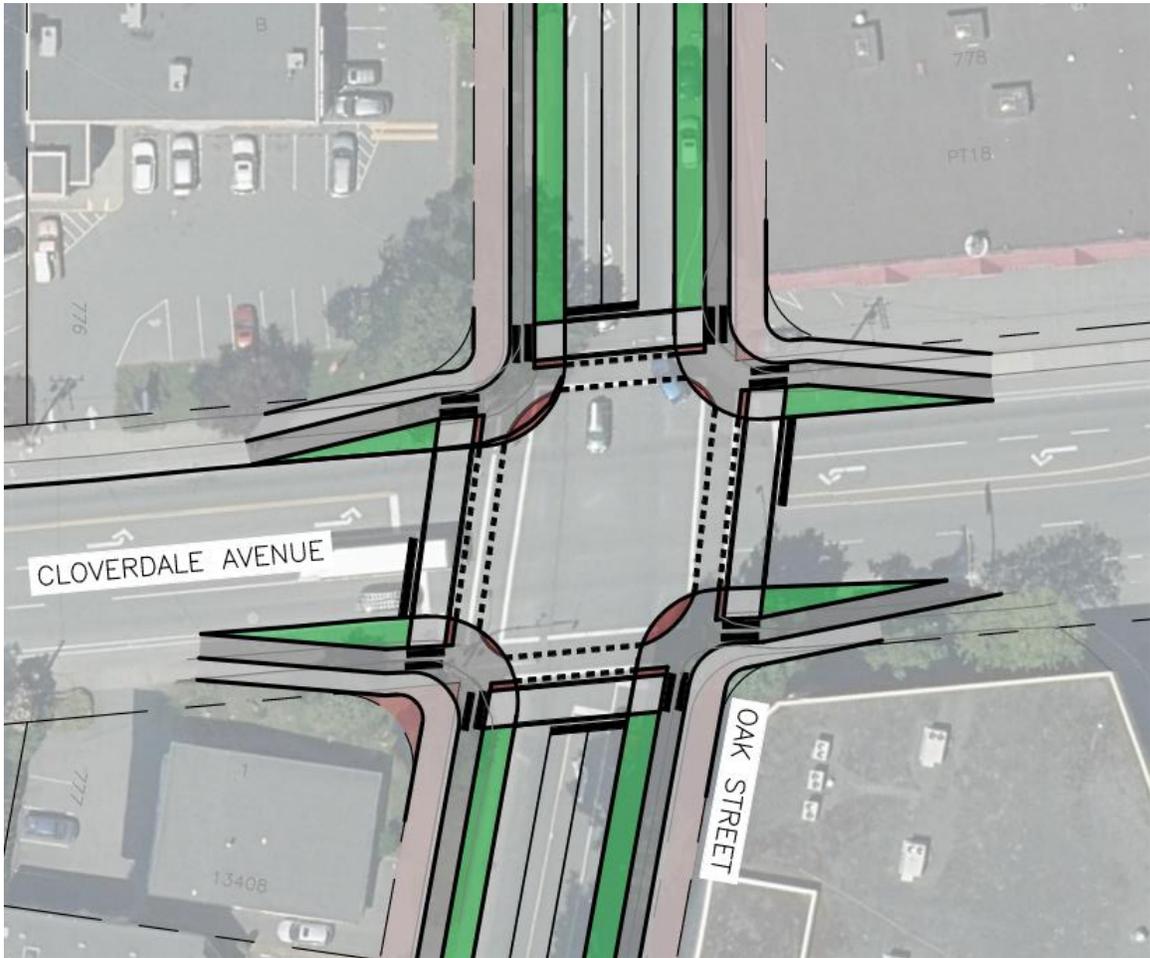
Oak Street / Cloverdale Avenue Preliminary Intersection Design
